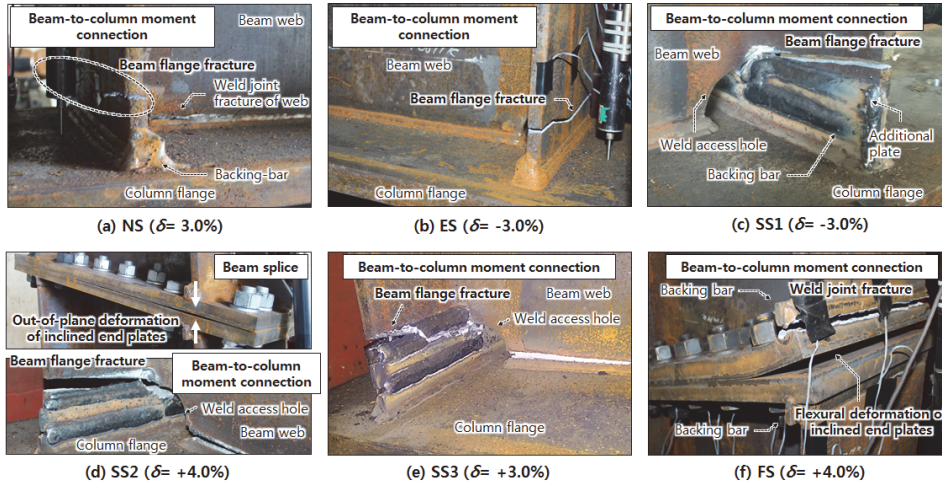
Failure modes at beam splice and beam-to-column moment connection
